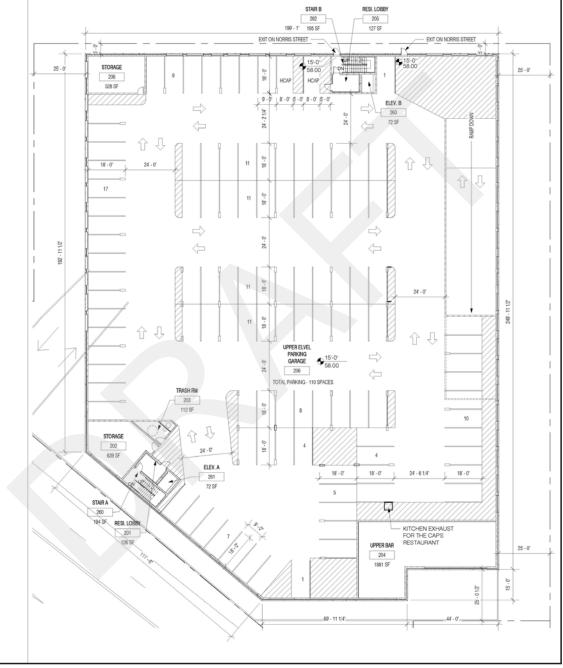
Conceptual Floor Plan Upper Parking Level Courtesy of Mistry Design
